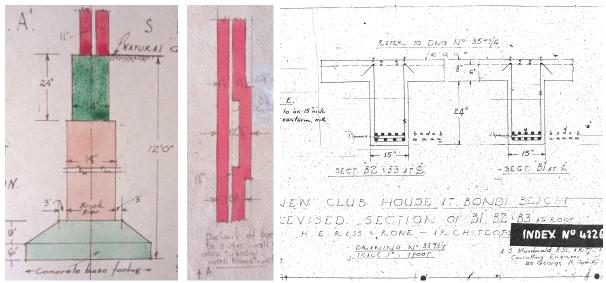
The original drawings show the 12'deep footing structure in section at left and the brick cavity wall structure in plan at right. Drawing conventions and note indicate the concrete pale green/green and brickwork pink/red. Source: WLS drawings Waverley Council Index No 432619 (left and centre) and No 432603 (right)
